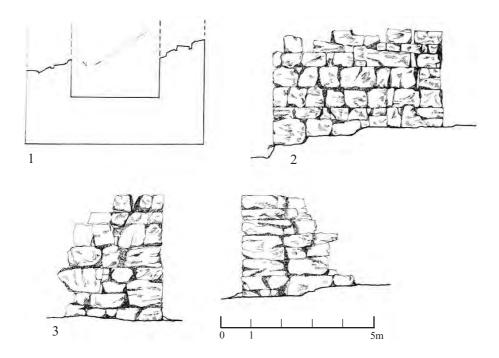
Ruins of one of the towers, village of Kushkhevi, Georgia, 2014. Plan: (1) a fragment of the western wall, (2) a fragment of the northern wall, (3) remains of the southern wall (drawing G. Kipiani).
